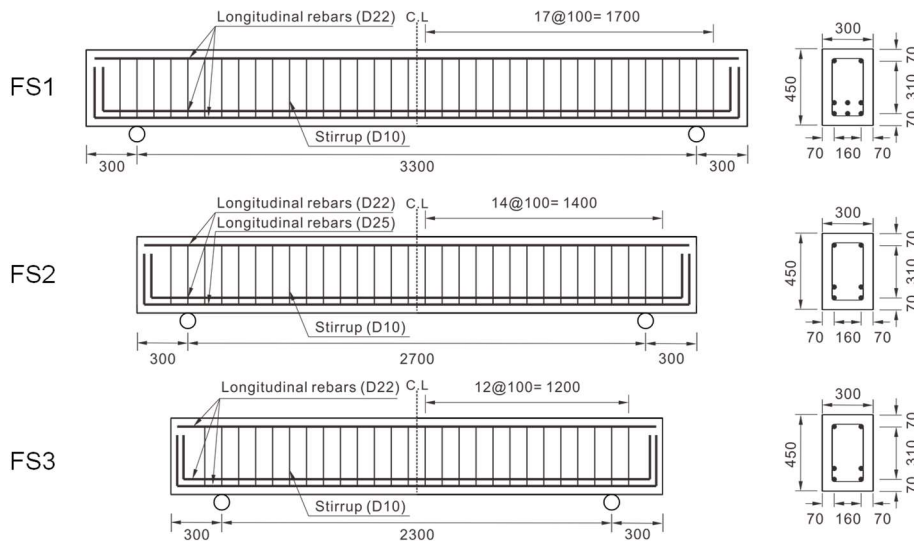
Drawings of RC beams (Ahn, 2021)
